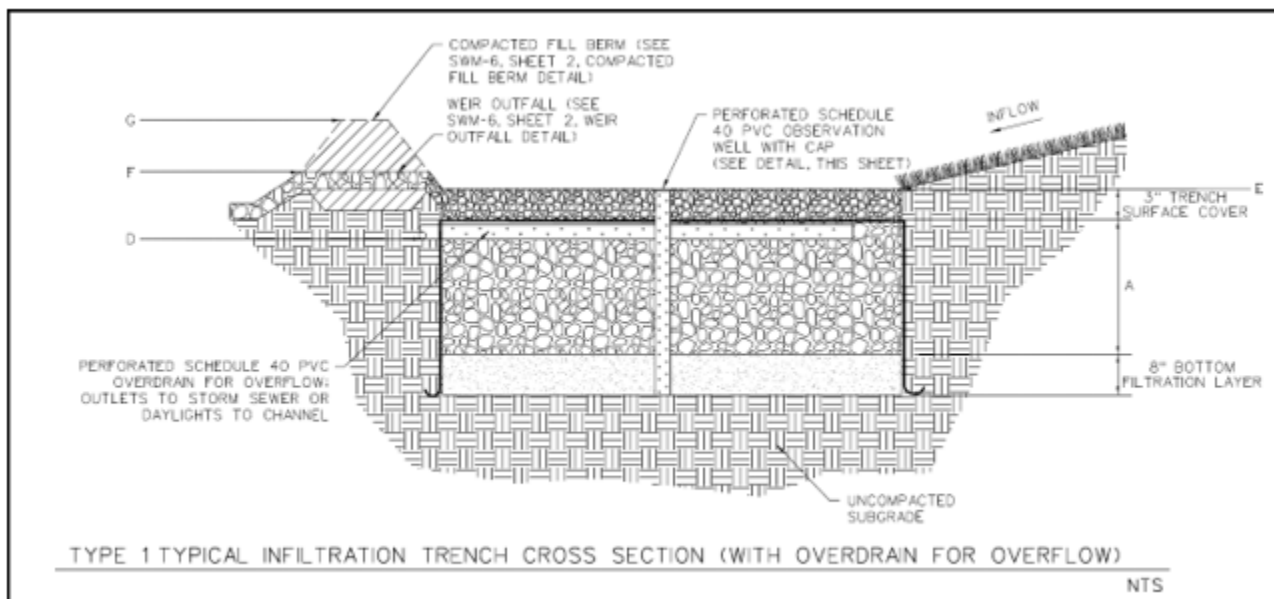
Typical Infiltration Trench Cross Section (with overdrain)
